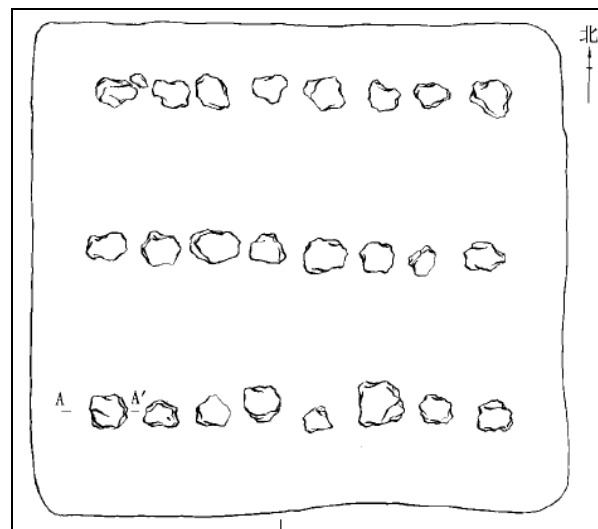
Floor plan of the 24 stones in Haiqingfang [5].
